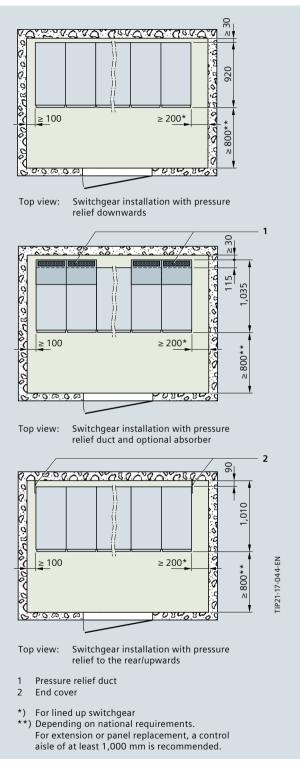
/15: Wall distances for 8DJH 36 (dimensions in mm)
